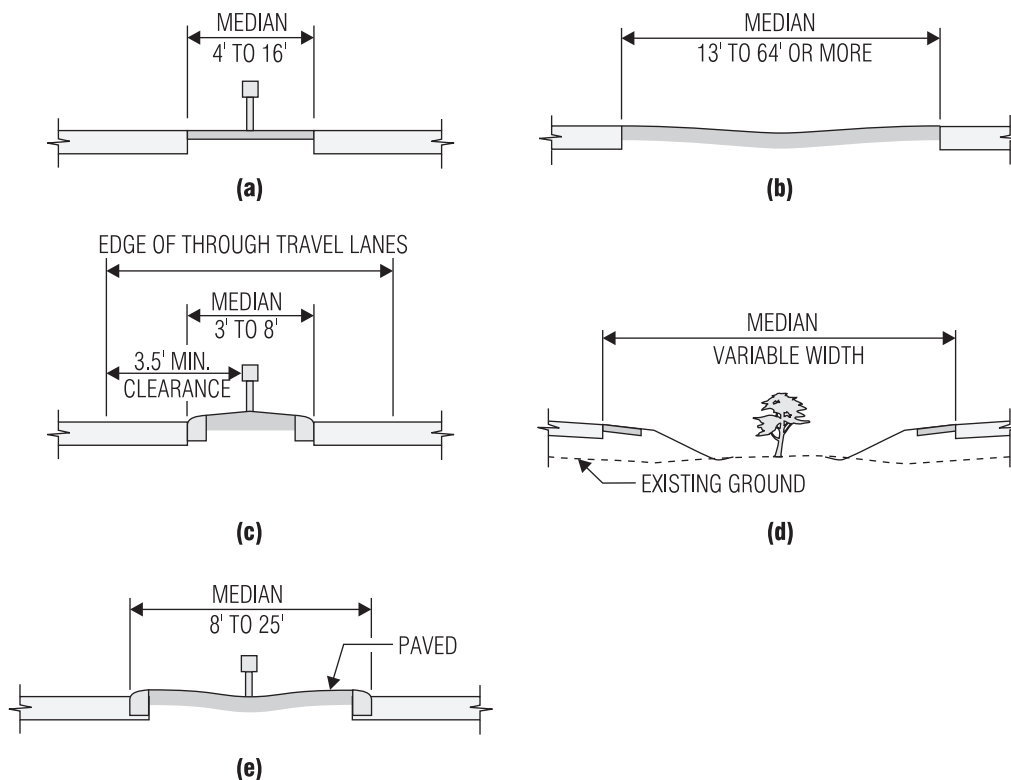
Cross sections of a highway with medians (a) paved flush; (b) with swale and paved flush (maximum slope, 1:6) when median width exceeds 36 ft; otherwise, paved and incorporating a median barrier; (c) raised, curbed, and crowned, with 3-ft width when optional median barrier is installed; (d) natural ground between independent roadways; (e) raised, curbed, and depressed toward median barrier.
